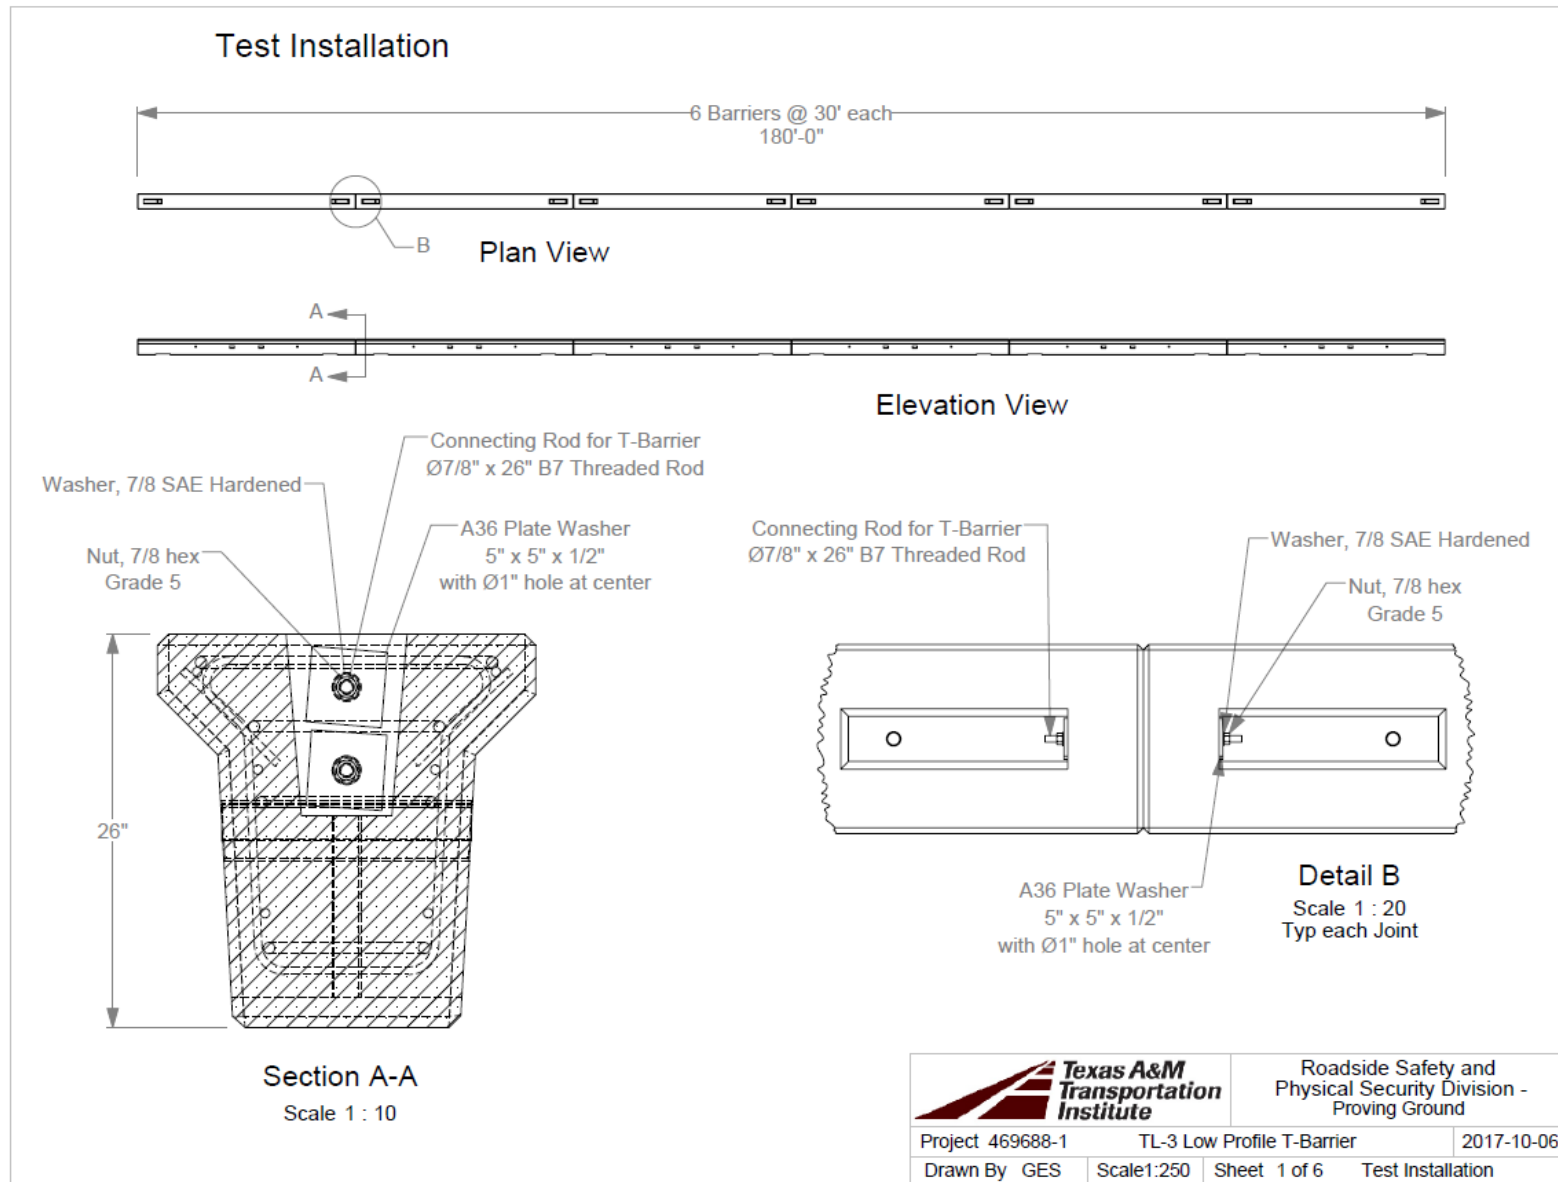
Overall Details of the 26-Inch Tall T Shaped PCB
